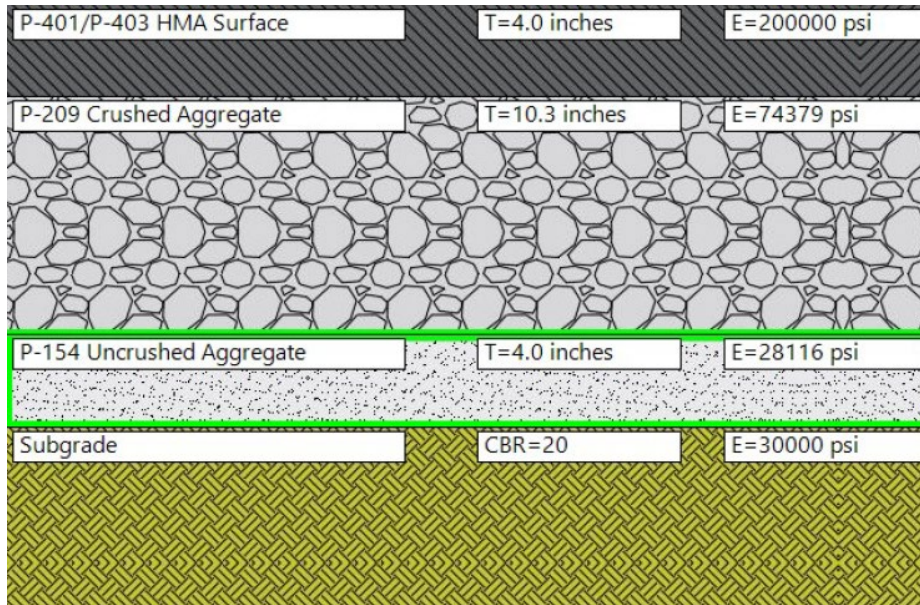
FAARFIELD Design Based on AC 150/5320-6G Using Design Traffic and Frozen Subgrade CBR at BRW
